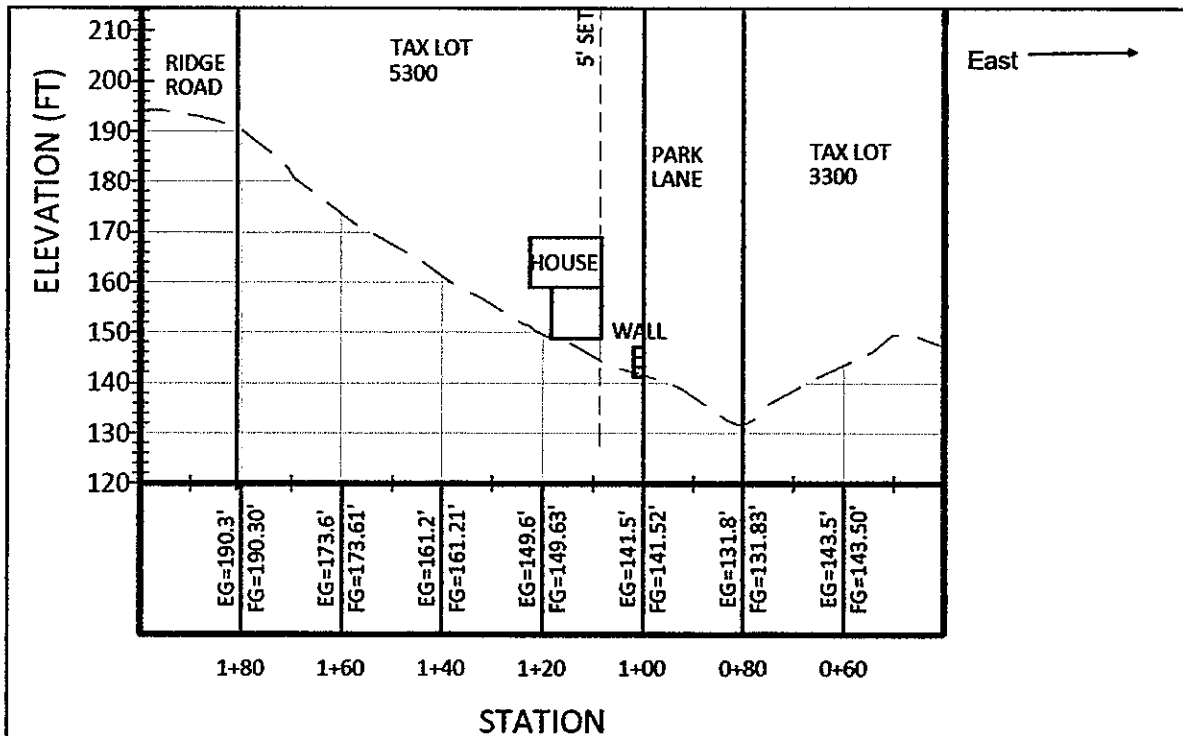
Slope profile through Tax Lot 5300, with building footprint and retaining wall section.
